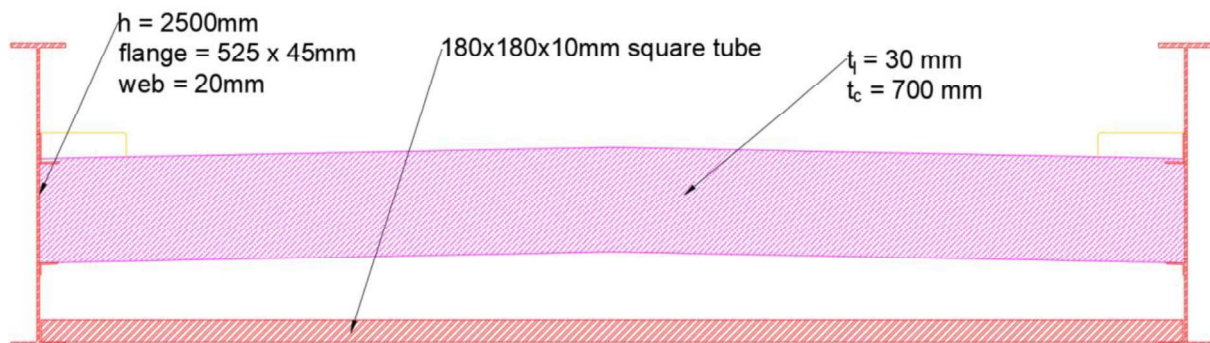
, Cross section MS variant 2, steel main beam with FRP deck, without crossbeam.
